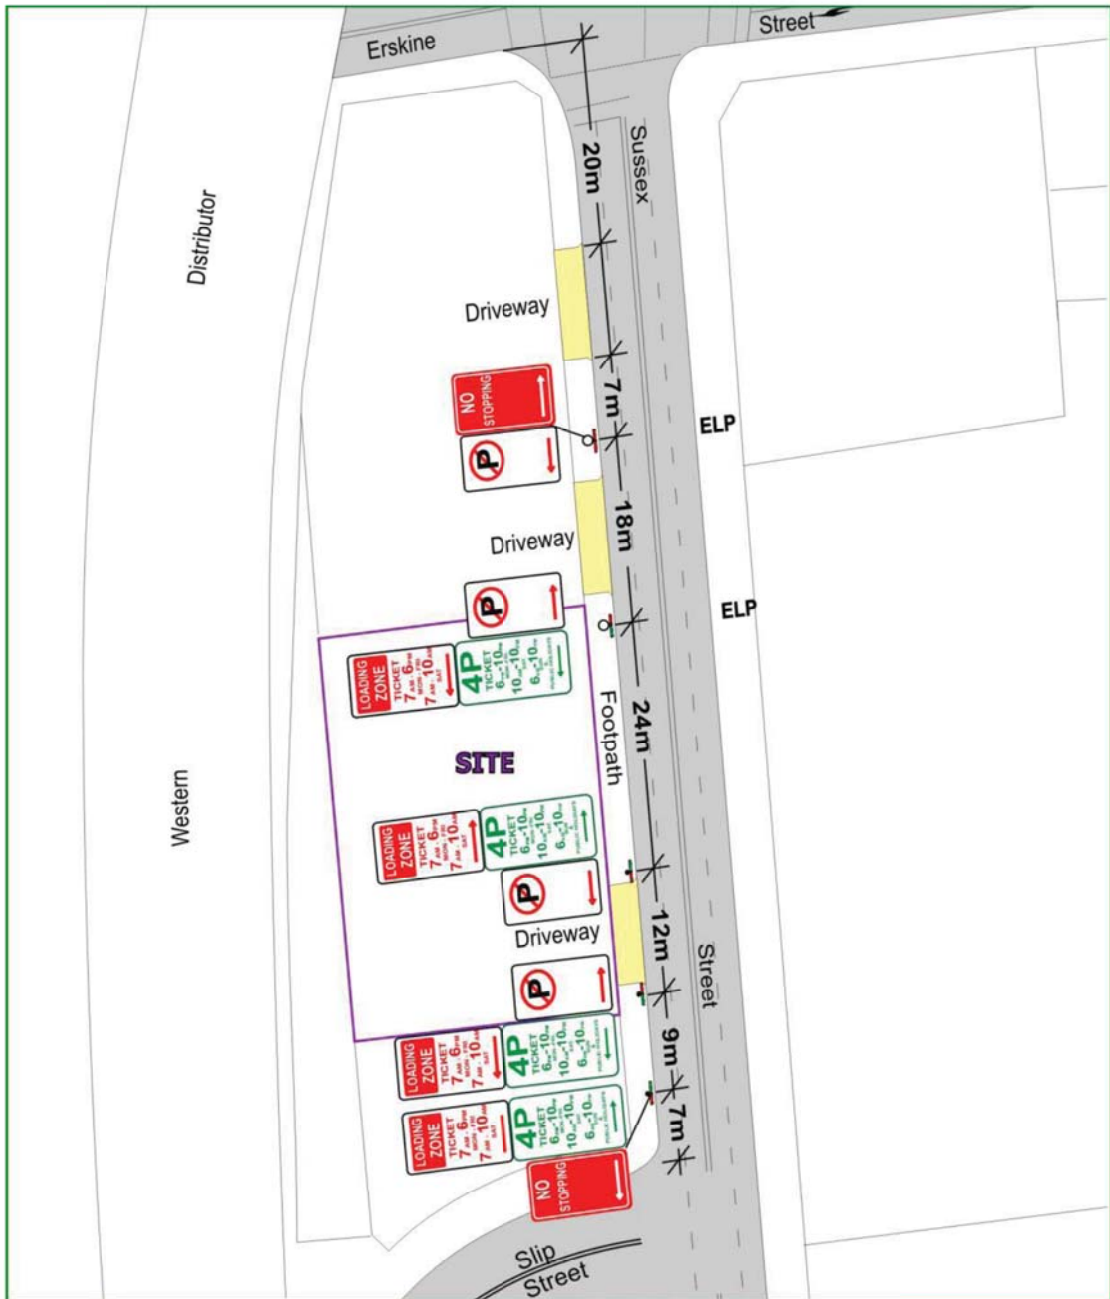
Existing On-Street Loading & Parking Conditions along the Site Frontage
